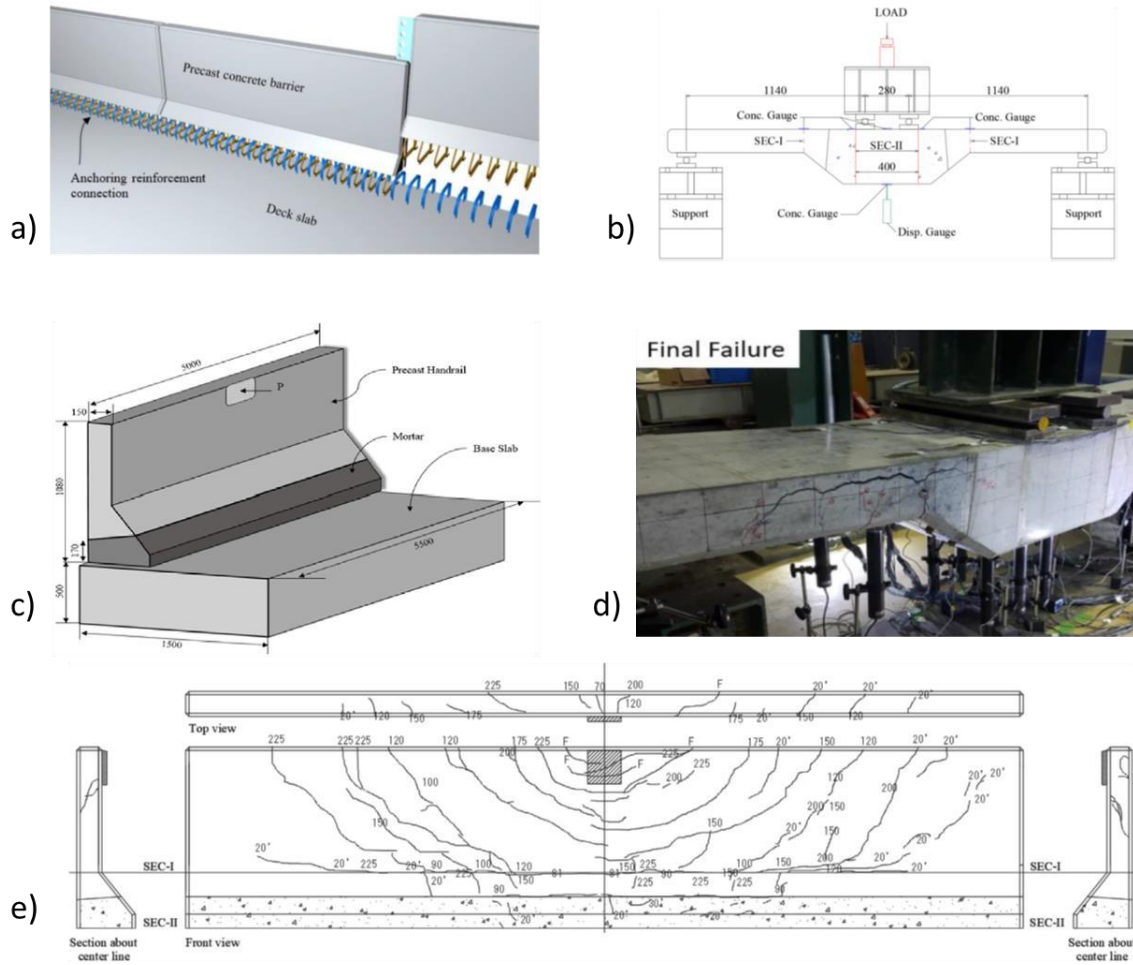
Research conducted at Saitama University on looped reinforcement connections: a) schematic view of developed precast concrete barriers, b) test setup for beam specimens, c) full-scale test setup, d) crack pattern for beam specimen at failure, and e) crack pattern of the full-scale specimen at failure [13].
